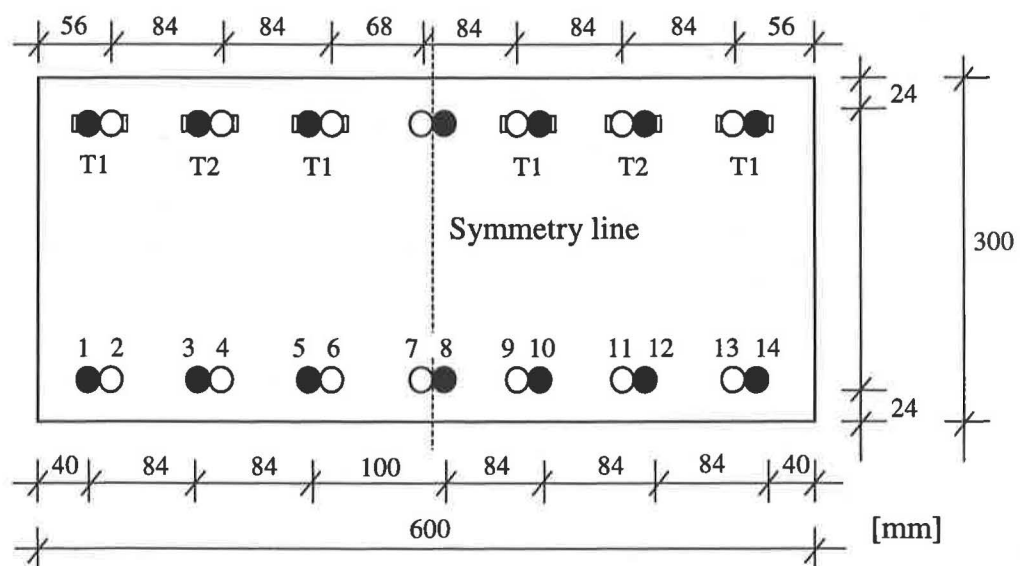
Reinforcement detailing of specimen RV12 (transverse section A-A).
